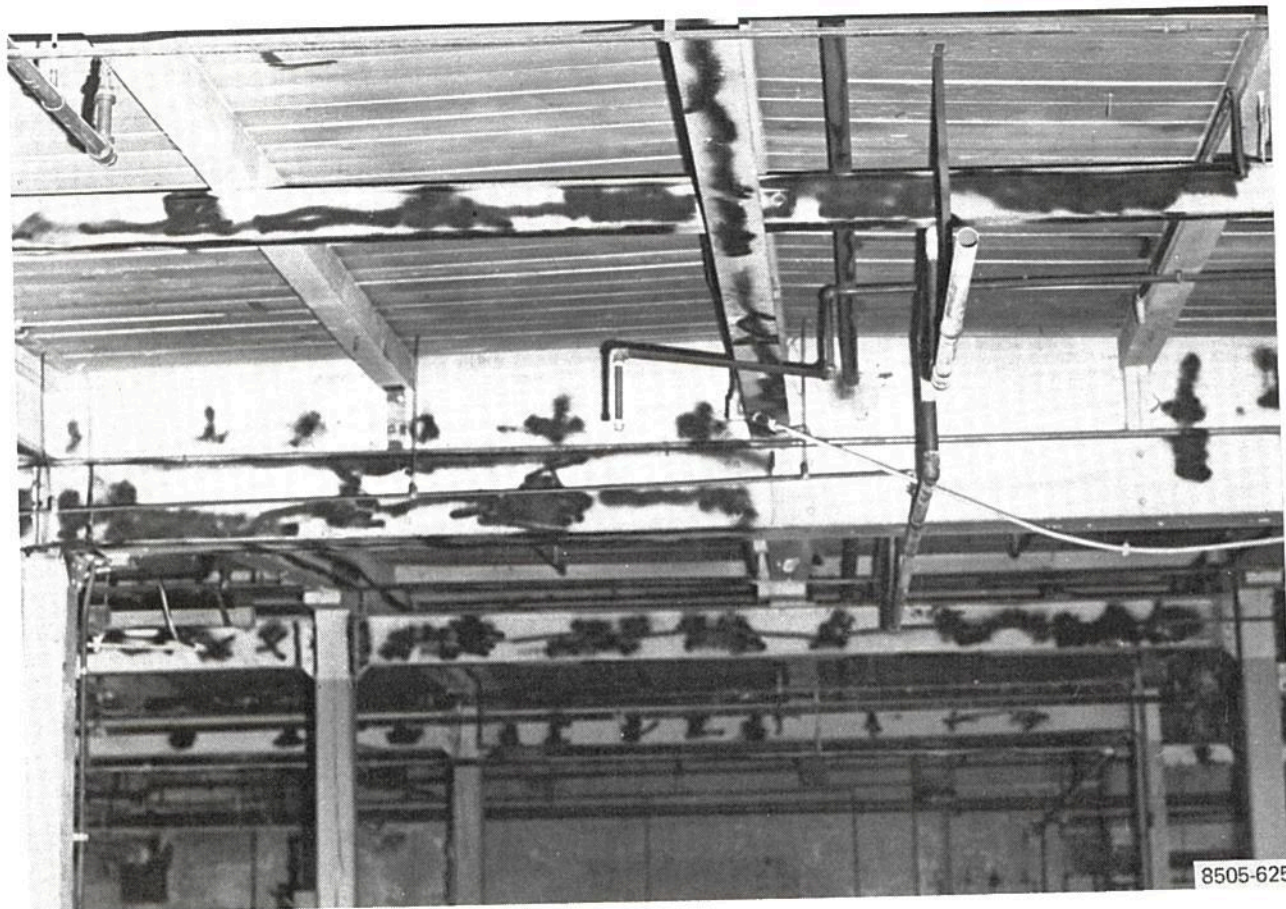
Rad-Contaminated Overhead Facilities (lighting, ducting, piping)
